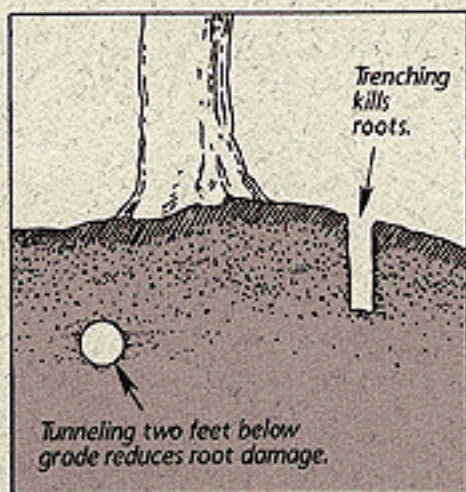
Protect roots from damage when laying utility lines by tunneling rather than trenching.
